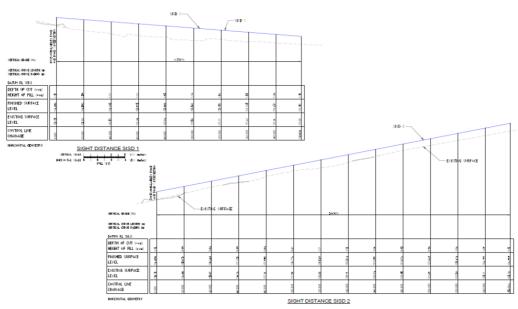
New Road (1) / Rosewood Laidley Road Intersection Sight Line Elevation Assessment
